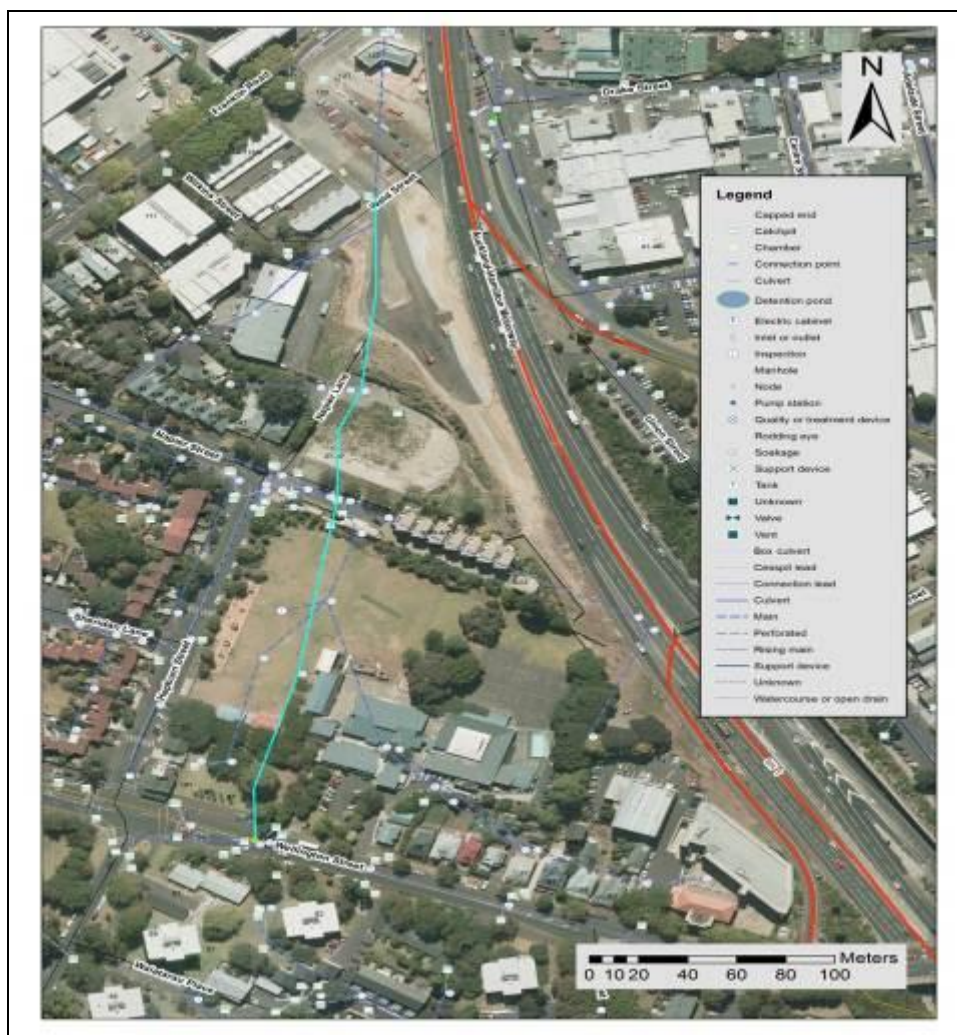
Site Location (Freemans Bay) - Plan view of the stormwater brick culvert
